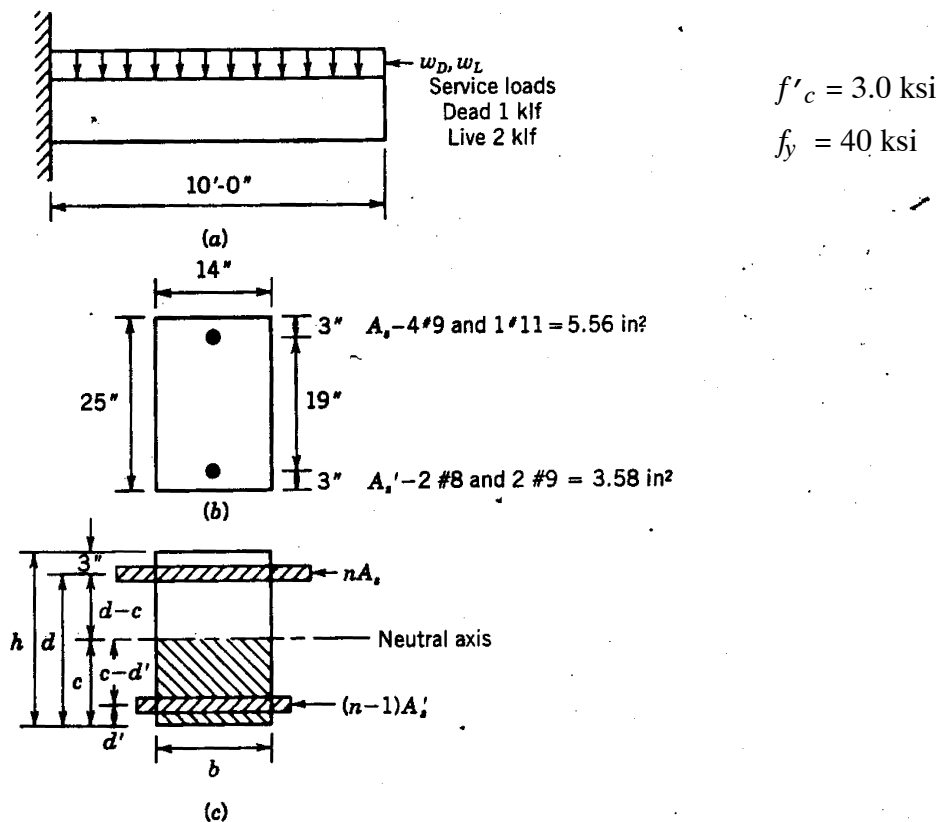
Details considered in deflection of cantilever beam, (a) Support and loading, (b) Cross section, and (c) Transformed cracked section.
